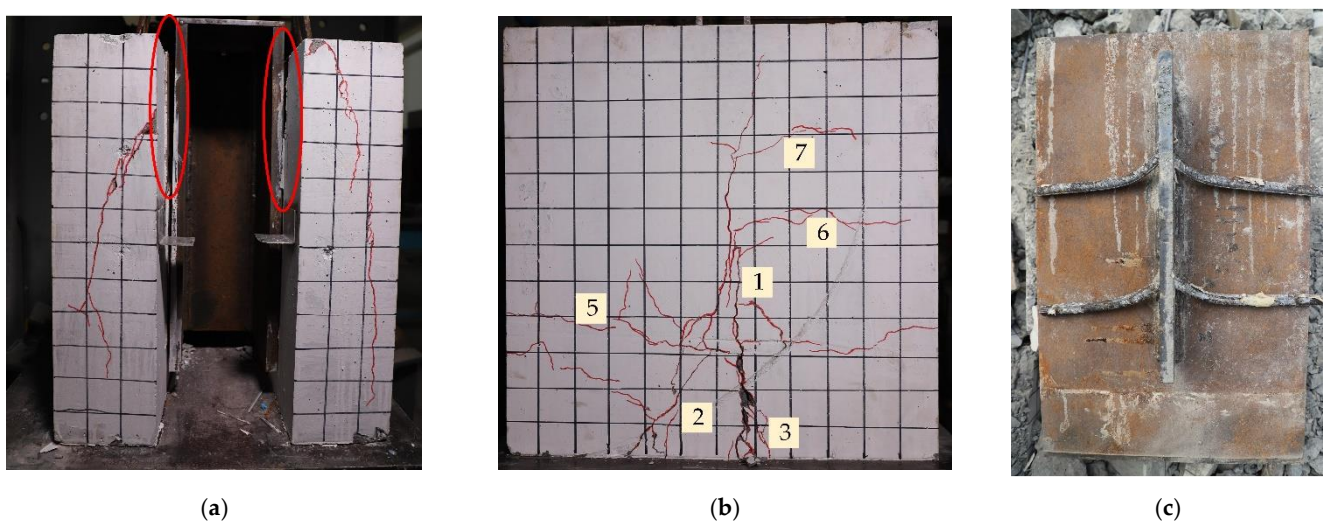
Failure modes of PBL shear connector: (a) front of concrete slab; (b) side of concrete slab; (c) perforated steel plate.
